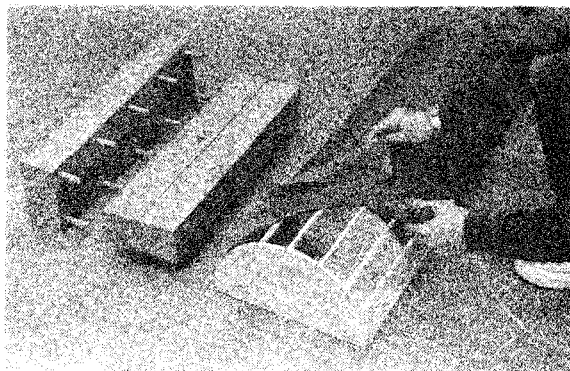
Models of elevated buildings, constructed from wooden blocks, and fabric-covered Jamesway huts both proved durable.
